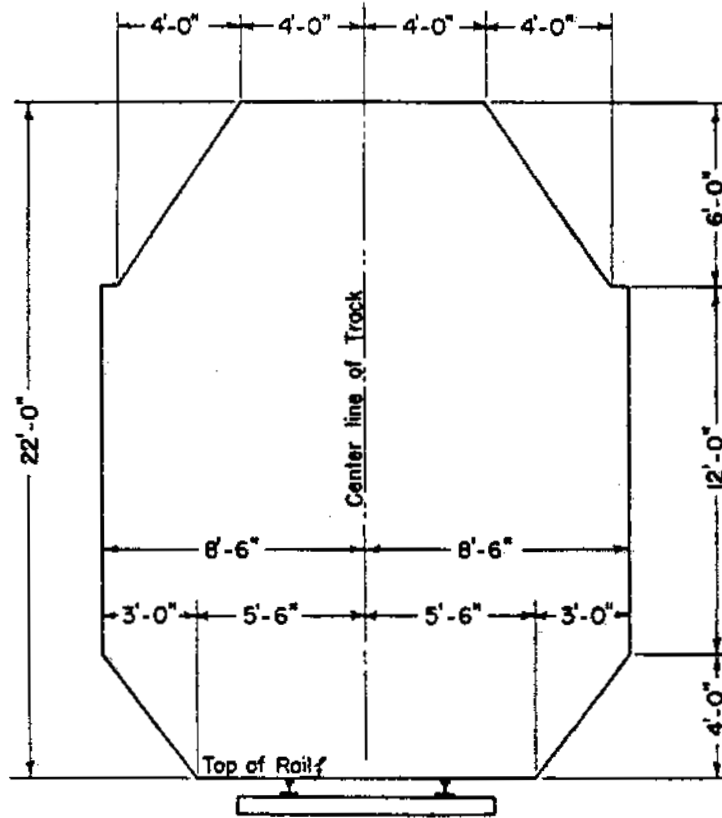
General Clearance Diagram for Structures Other than Bridges, Buildings, Platforms, Retainers and Guards.
